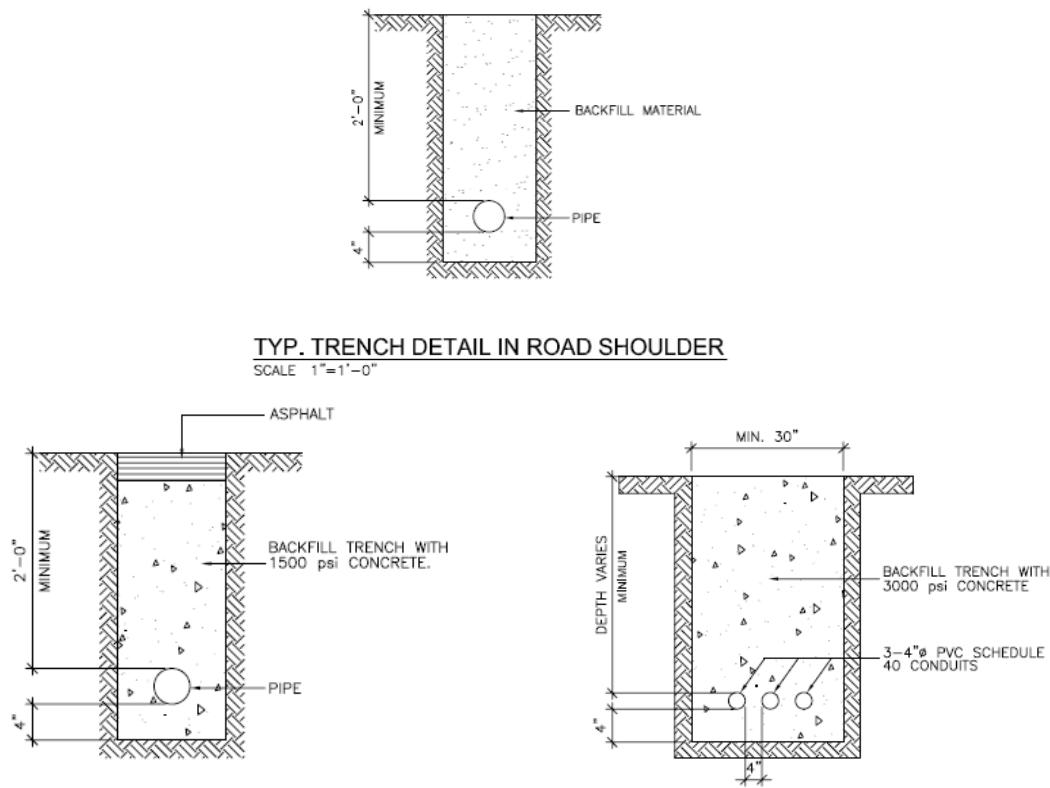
Trenching DetailsFigure 2-19: Bull Bay - Location of Manhole in Proximity to roads and buildings
